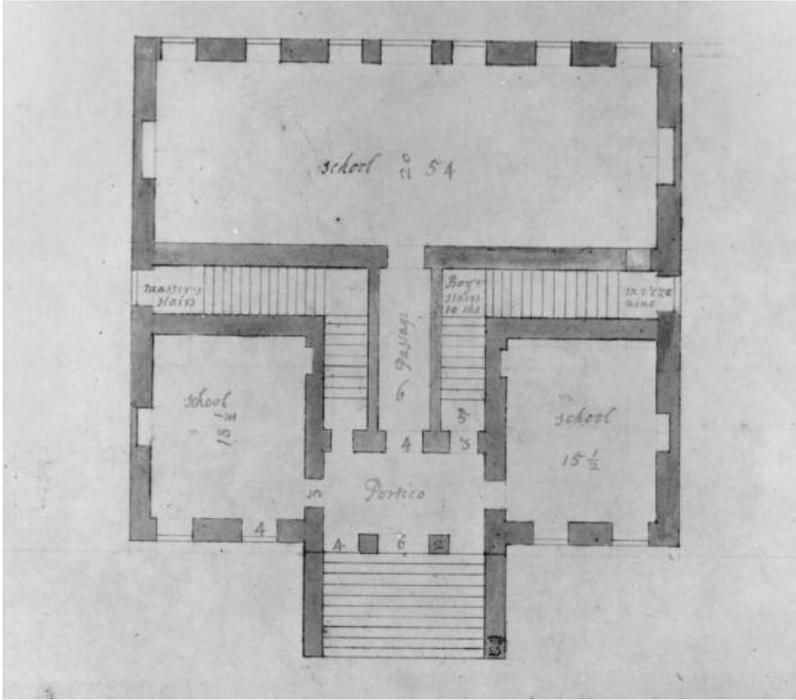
Lord Burlington, plan of proposed school house. *RIBA*.
